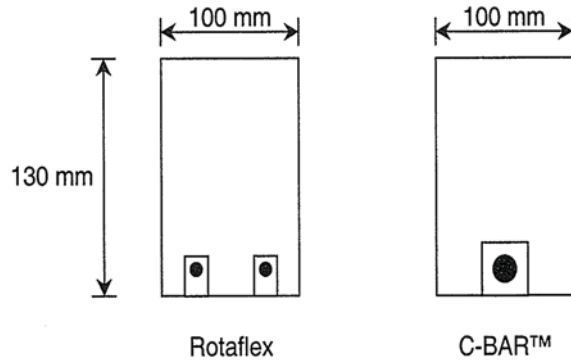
Cross-section of bond specimens (Gentile et al. 2002)
